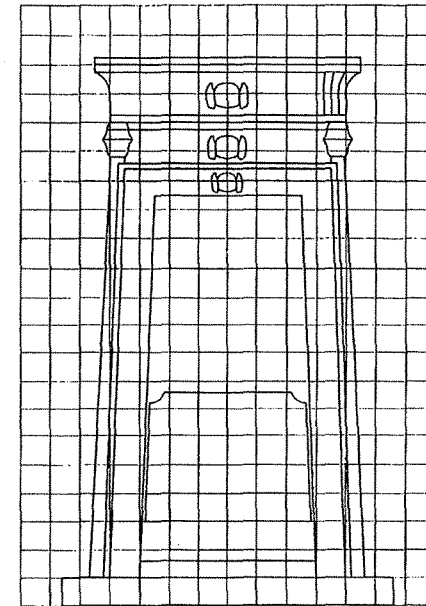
Elevation of a wooden shrine of the New Kingdom, drawn in grid on papyrus (restored).
